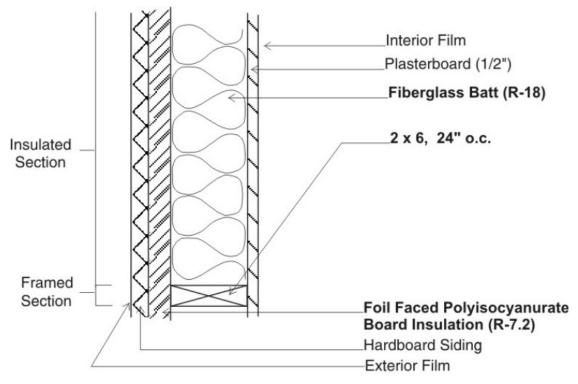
Case L120A Exterior Wall Construction (ANSI/ASHRAE 2011, Figure 7-9
